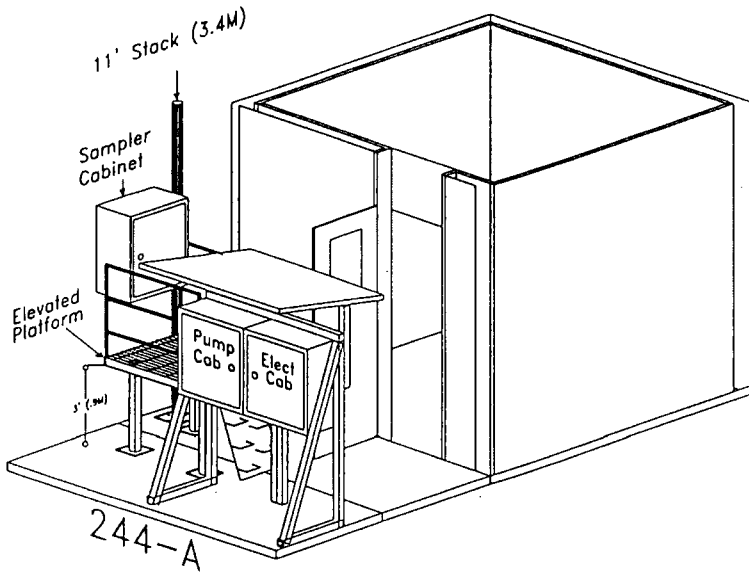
244-A DCRT - Elevation View of Upgraded Facility
